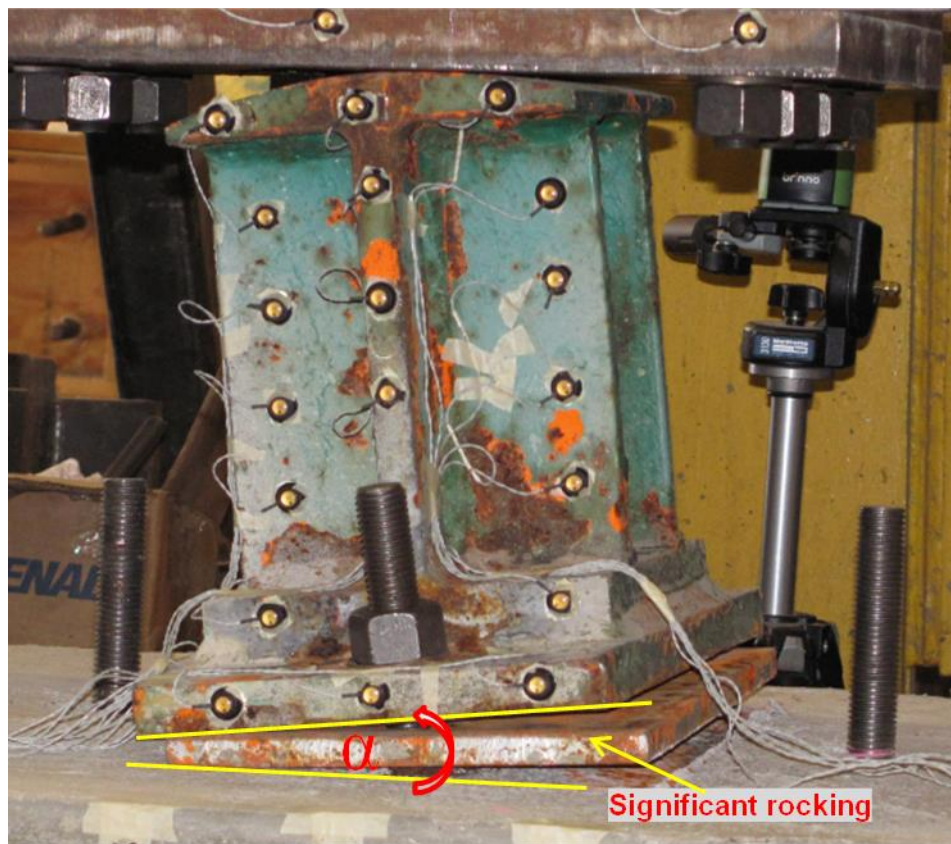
Photograph showing significant rocking of the bolster bearing due to anchor bolt pullout at larger displacements
